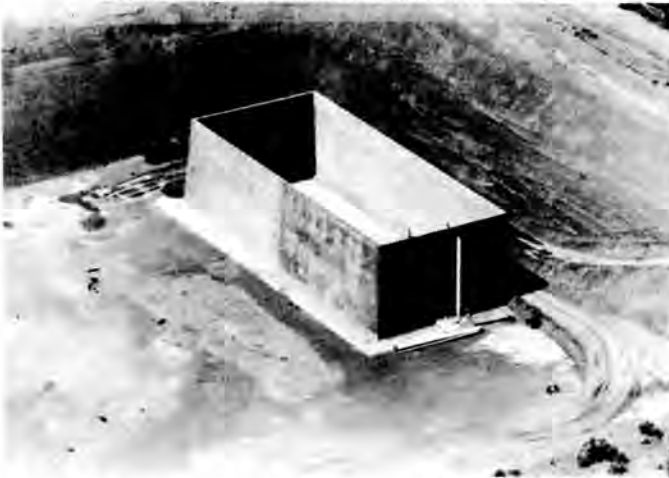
A grout vault under construction. The vault is sealed and buried after being filled with the concrete-like grout. Each vault has a capacity of over 3,800 cubic meters (one million gallons) of grout.
